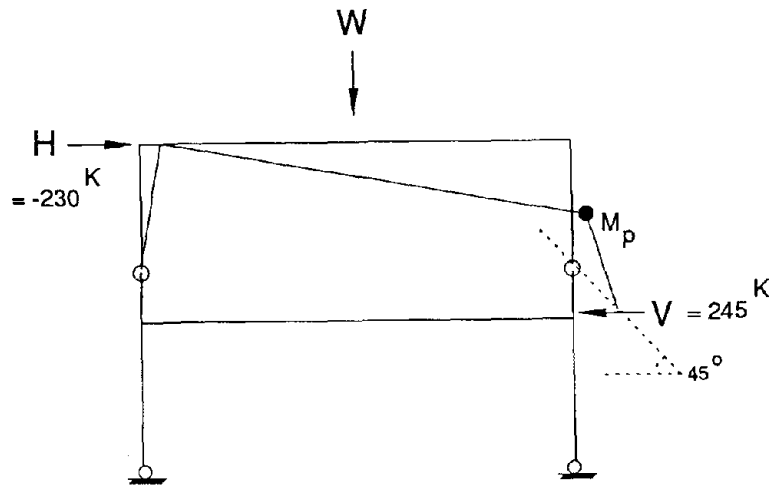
Pedestal Shear Failure Stick Model Collapse Mechanism
